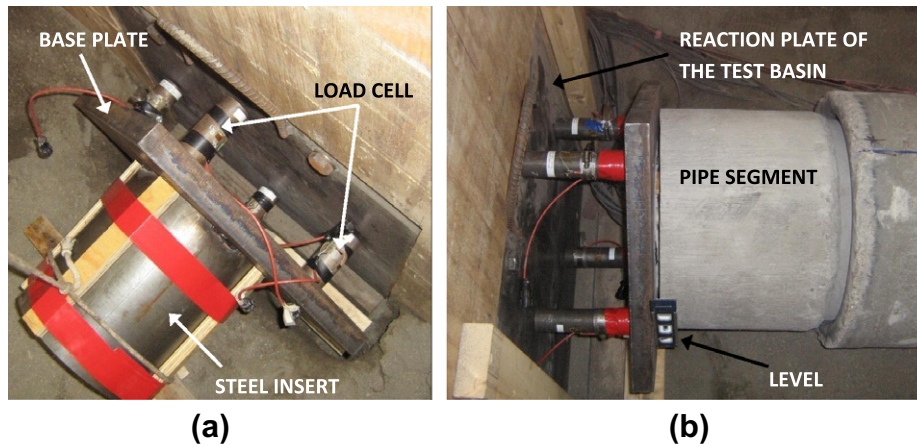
(a) Heavy steel fixture designed for load transfer from pipe to load cells, (b) north (moveable) end of the pipeline after mounting the fixture.
